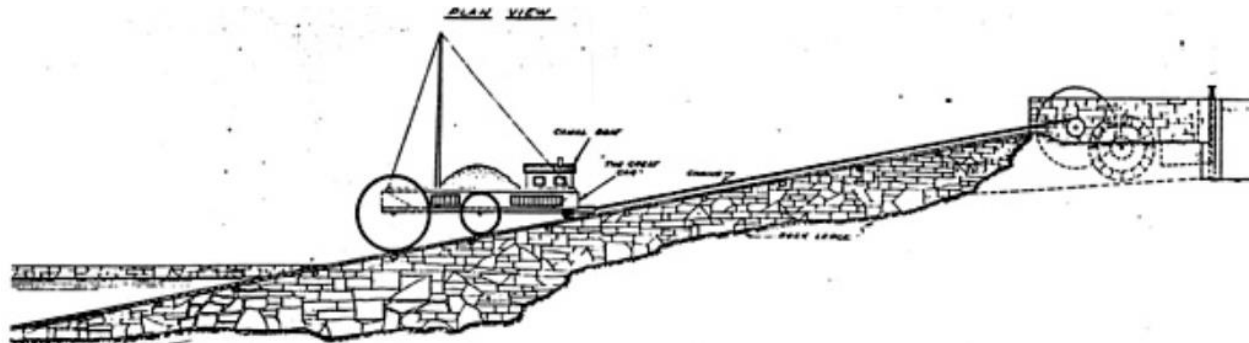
Drawing of Incline plane built on the Connecticut River Canal at South Hadley used during 1795-1805.
